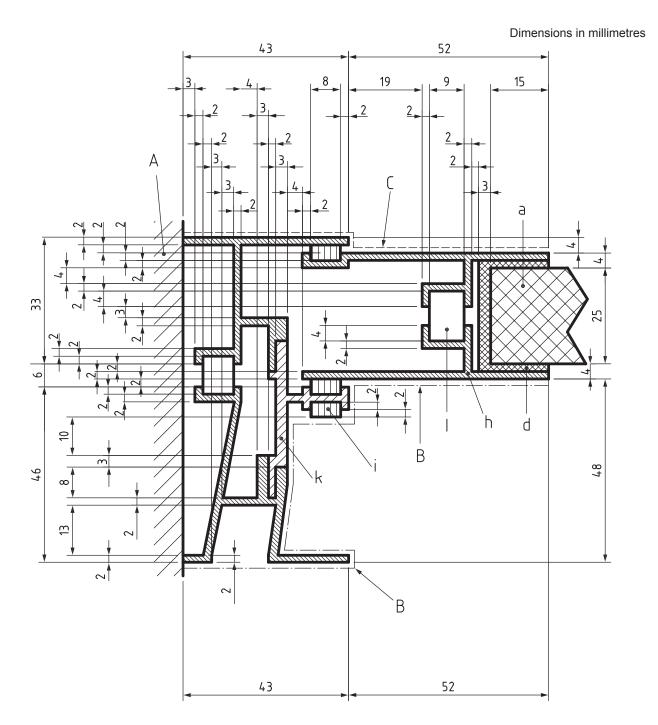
Sliding window frame section and insulation panel ( $b_{\rm f}$  = 95 mm)
